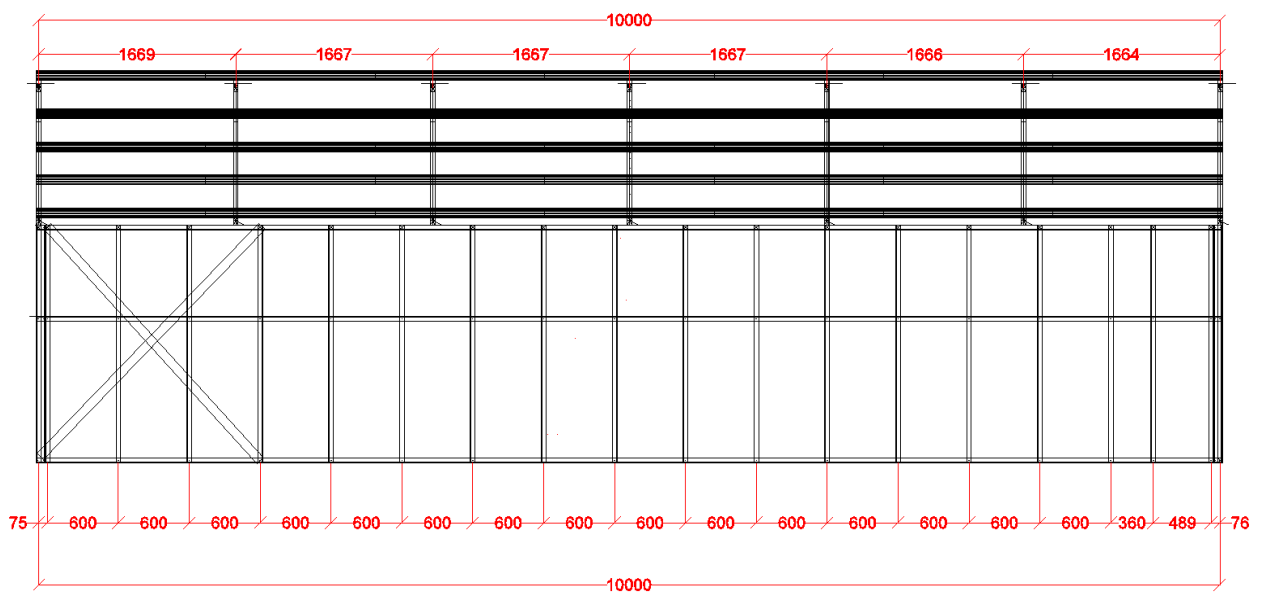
Cold-formed Steel Wall Framing Dimensions
